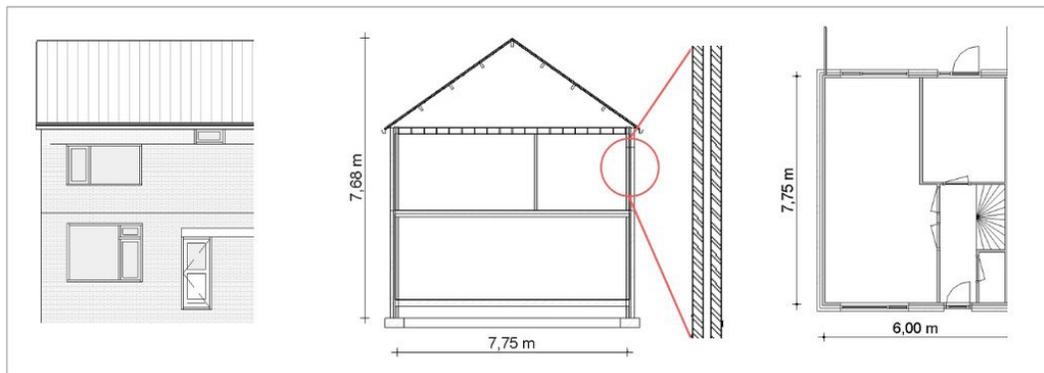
Existing terraced dwelling: south façade, section, façade structure and floor plan
